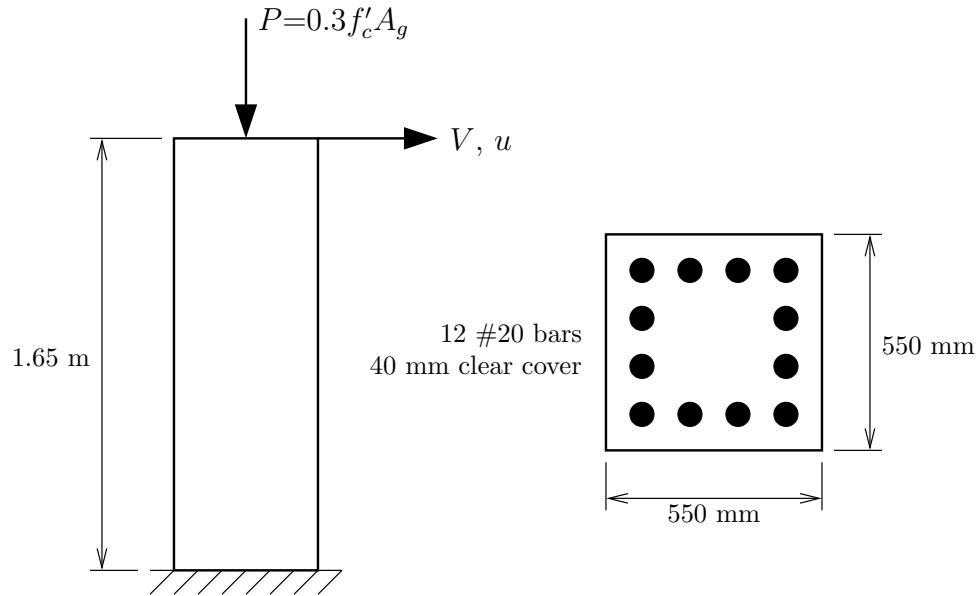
Reinforced concrete bridge pier configuration, reinforcement details, and material properties.
